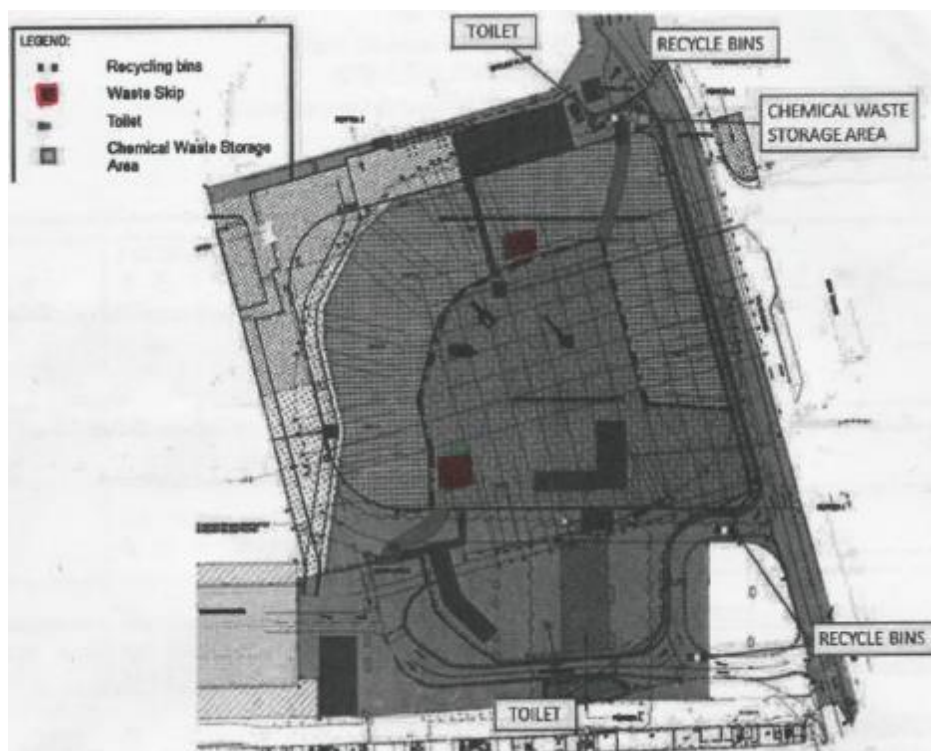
Site Plan (with On-Site Waste Storage Arrangement)
